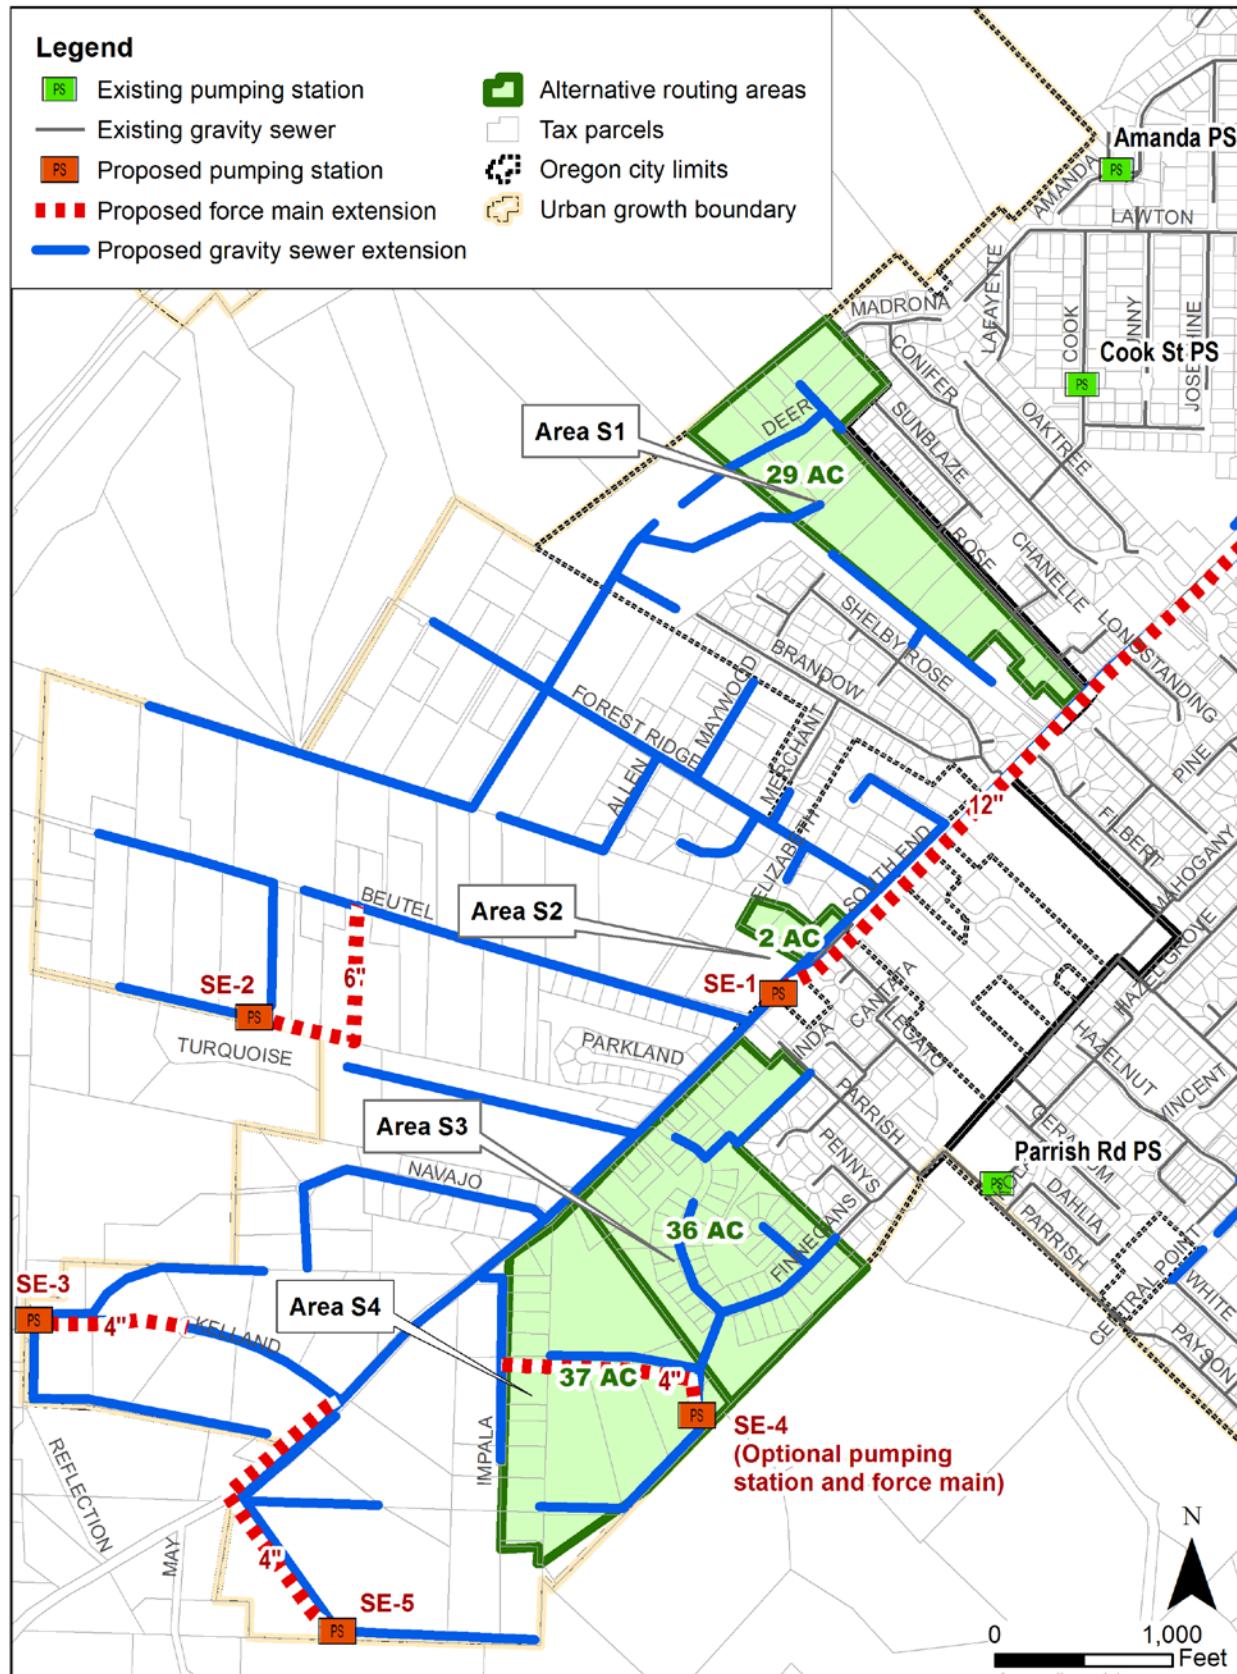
South End Concept Area, Parrish Road Pumping Station options
